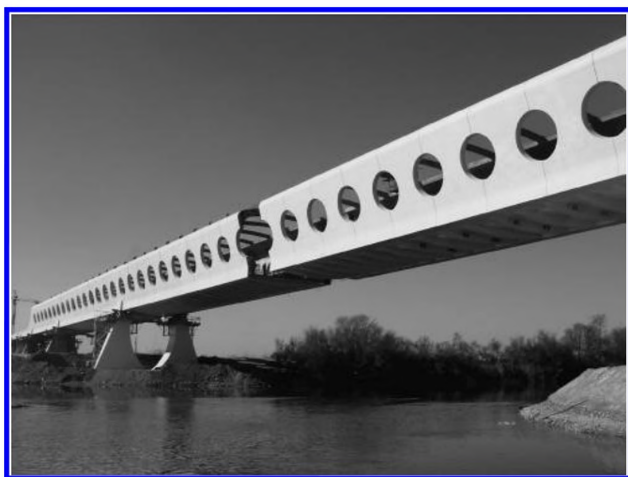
Bridge over the Ebro River before construction of midspan segment.
